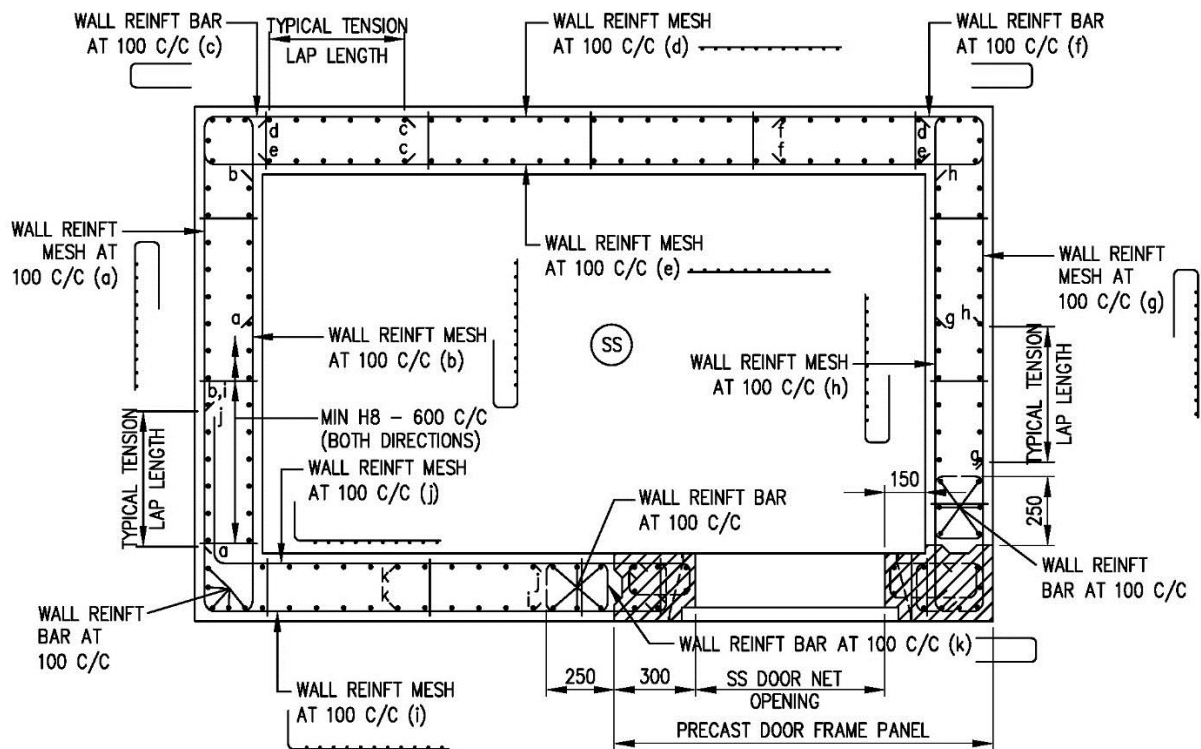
PLAN OF PRECAST HS, SS or SSS DOOR FRAME (TYPE 2)
